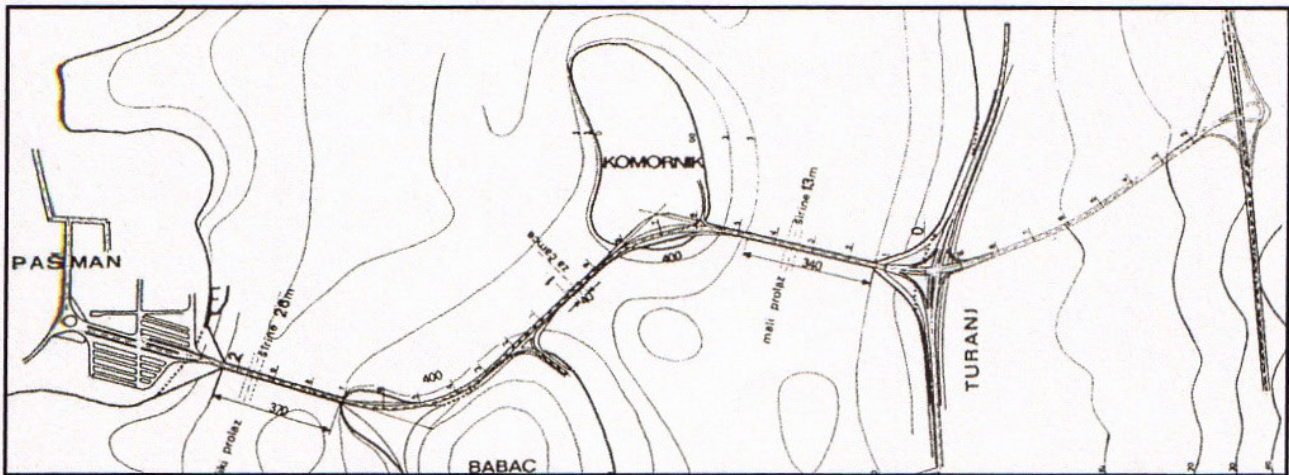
Plan view of the bridge crossing utilizing the two mid islands (Tonković)
